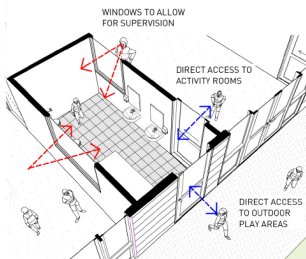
Bathroom facilities to have direct access to outdoor areas and activity rooms. Supervision requirements need to be considered in the design to prevent blind spots.
